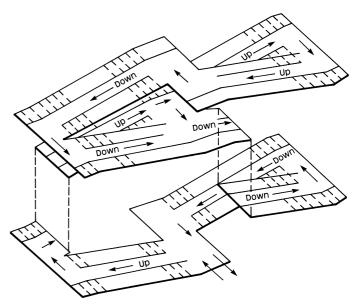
Ramped floor car park with interlaced entry and departure parking ramps
